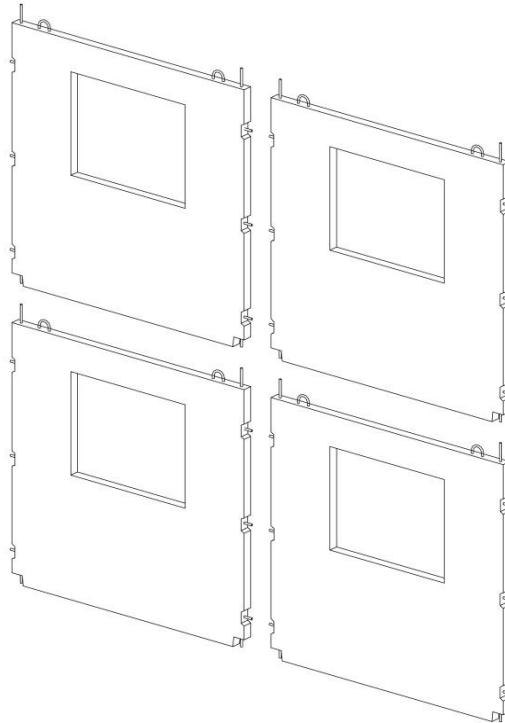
Demountable prefabricated reinforced concrete *Sayab* panels.
